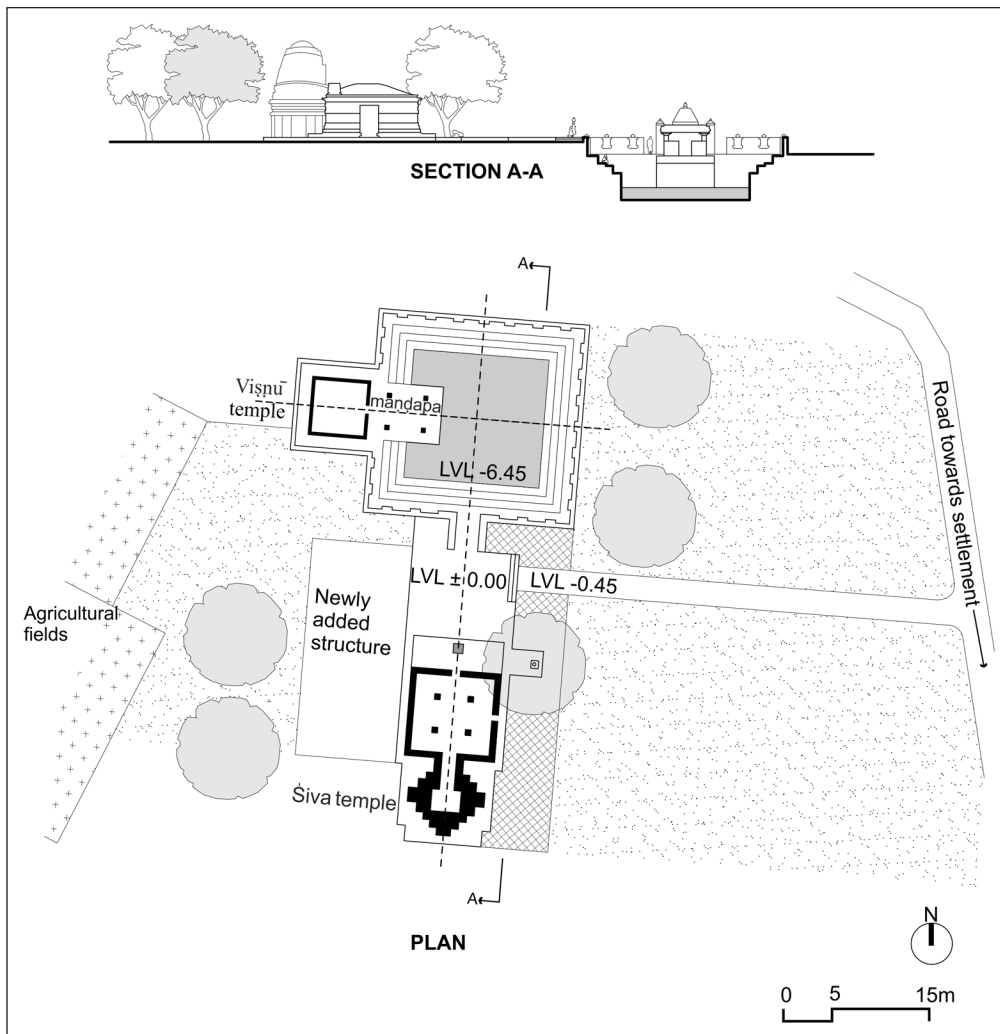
Plan and section of the temple precinct at Loṇī Bhāpkara.
